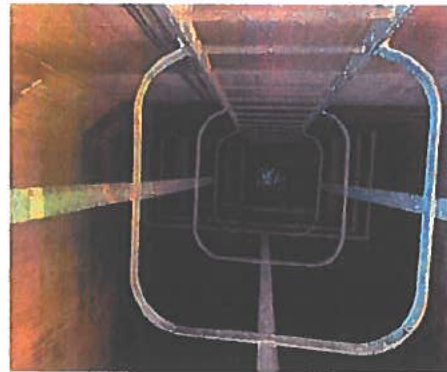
Pevensey Central Outfall - Outer chamber. South Sub-Chamber (Beach side). Existing access arrangement.
